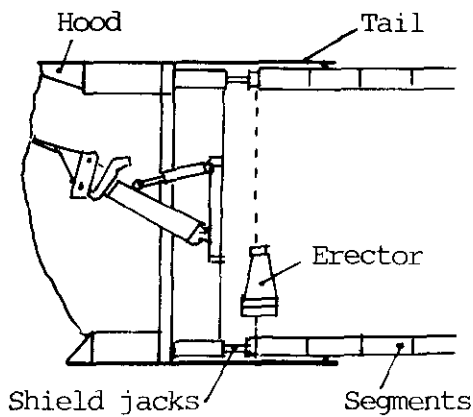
(a) shows a typical longitudinal section of a conventional open face type shield, which requires manpower for excavation, so it is called a "hand mining" shield. This shield is applied where the ground condition is favourable. Sometimes, the face is supported by face jacks and sheathing to prevent collapse.
